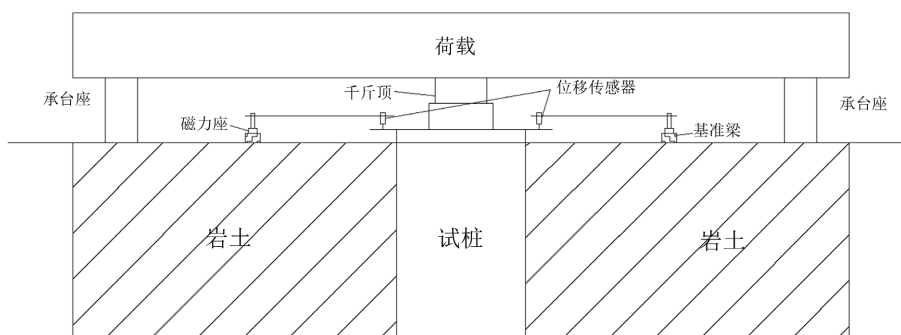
Schematic diagram of vertical compression static load test of single foundation pile
